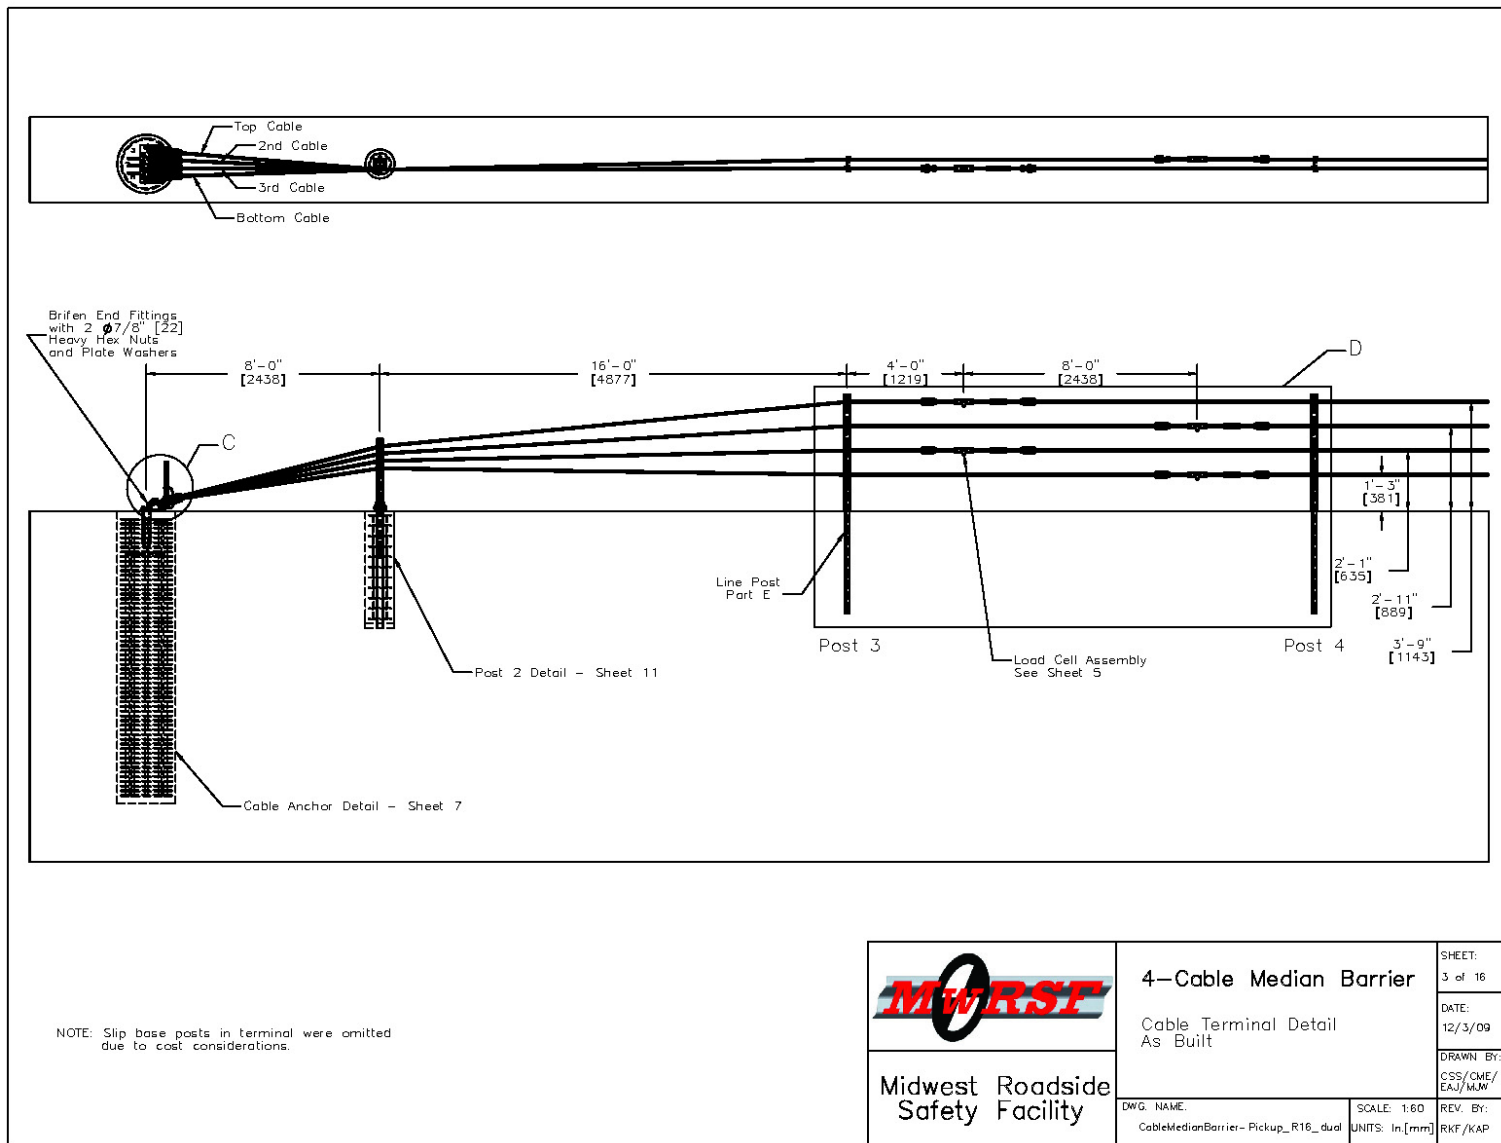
Cable Anchorage Details, Test No. 4CMB-1, 2007 [66]
